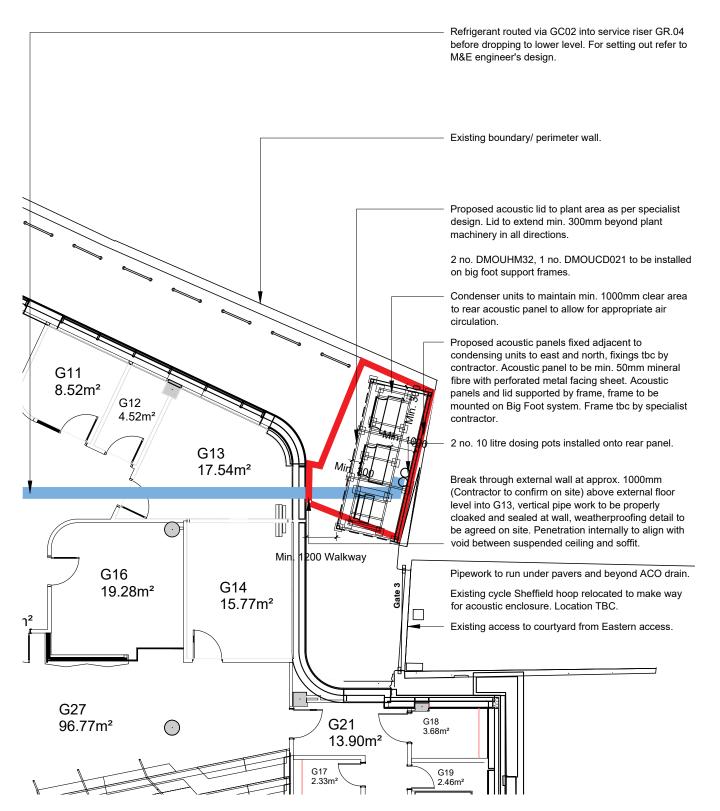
Ground floor plan (not to scale) showing the external access/courtyard area in which the condensers are proposed.
